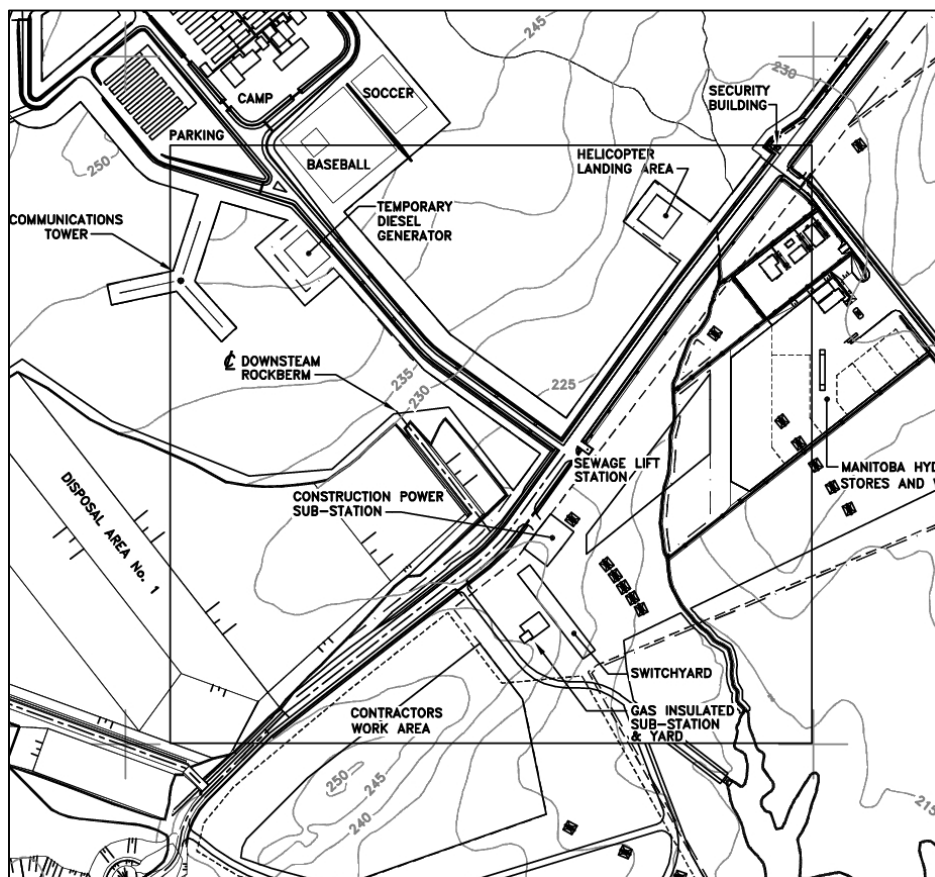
Insert of Plan View of Construction Site Layout (Figure 2.4-2), detailing the Construction Power sub-station and the Permanent Switching Station (Gas Insulated sub-station and Switchyard).
